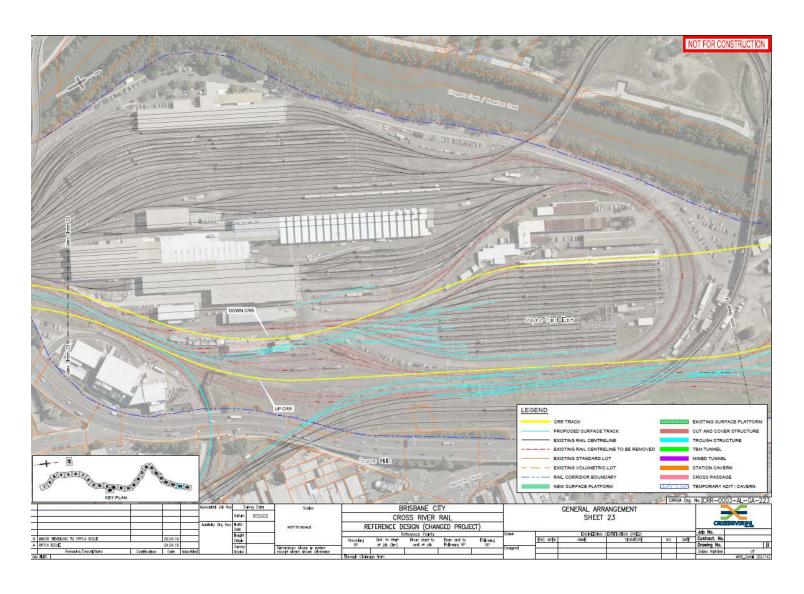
Project work at Mayne Railway Yard located within the existing rail corridor
